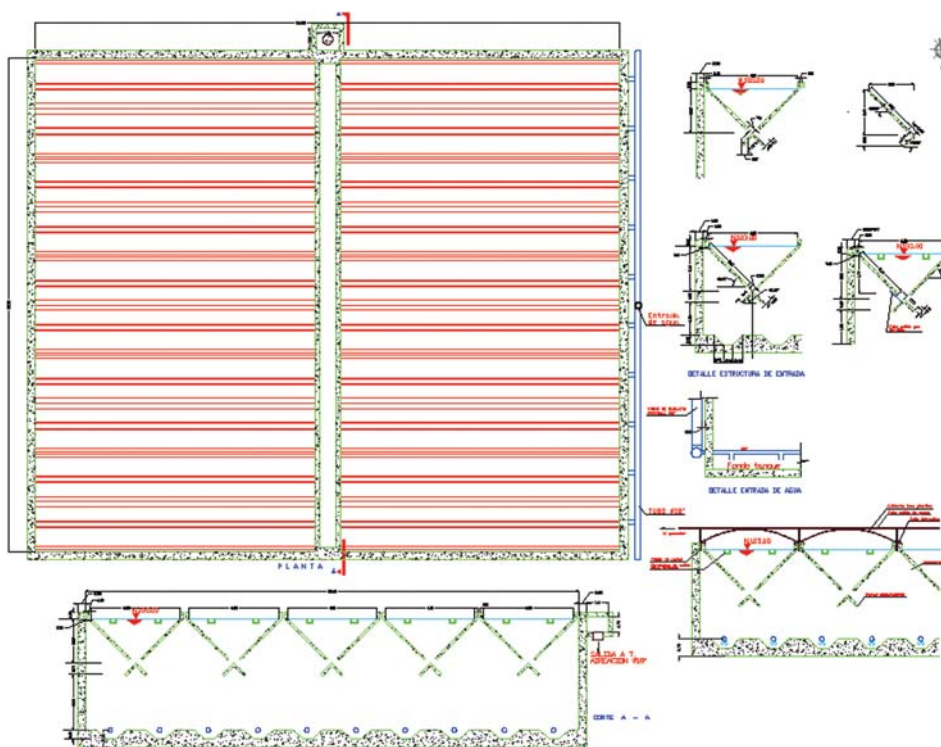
Plan and sections of a typical UASB reactor with inlet and outlet structures
